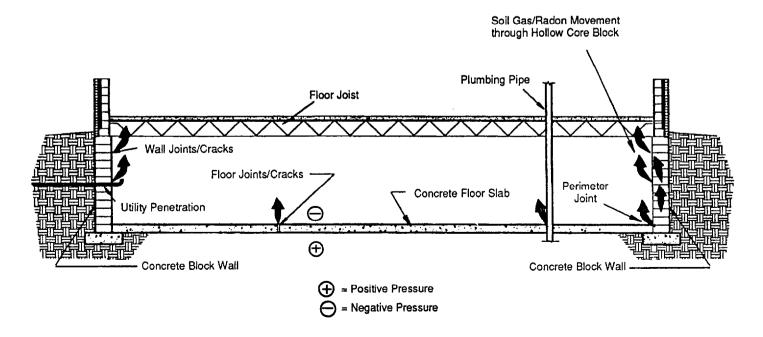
Typical radon entry routes in concrete block basement walls.
